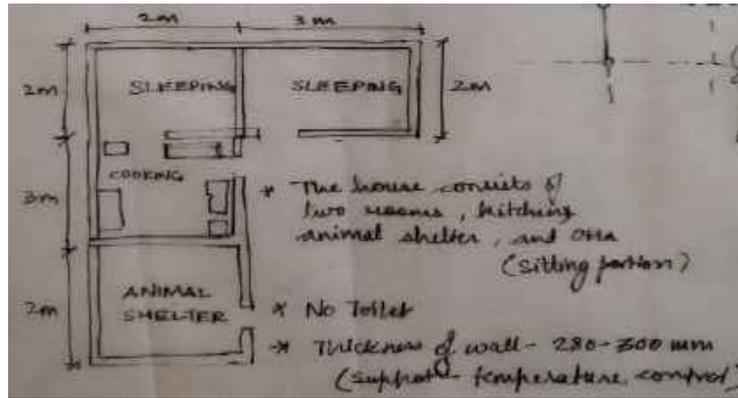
Plan of a rural house in Bastar; Source: Author
